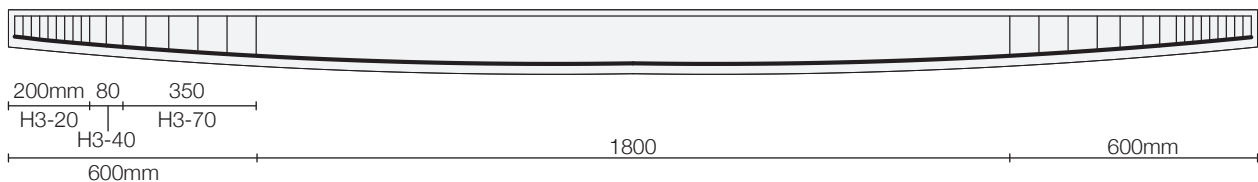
Beam 8\_2 elevation and transverse steel requirements.
